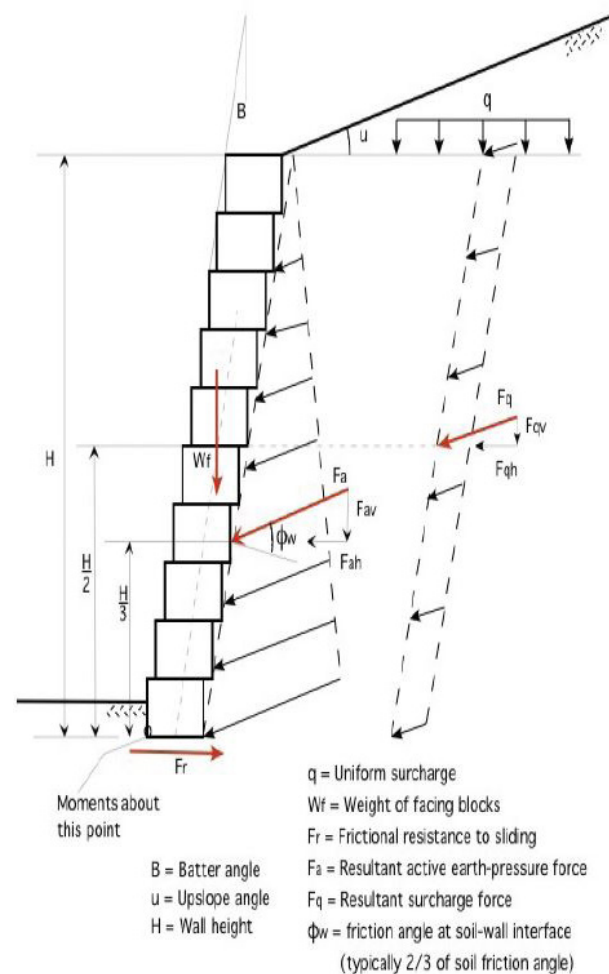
Lateral earth pressure and surcharge forces acting on a modular block wall (adapted from NCMA, 1996)
